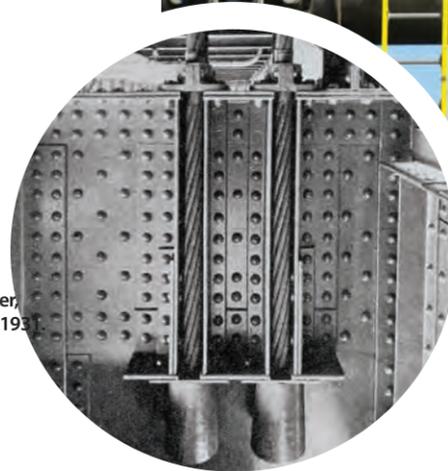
Below the GWB bridge deck, the lower suspension connections of the 2 7/8 inch suspender ropes with the cross beams is an area subject to corrosion from moisture and road salts. Engineering News-Record, 1931.
